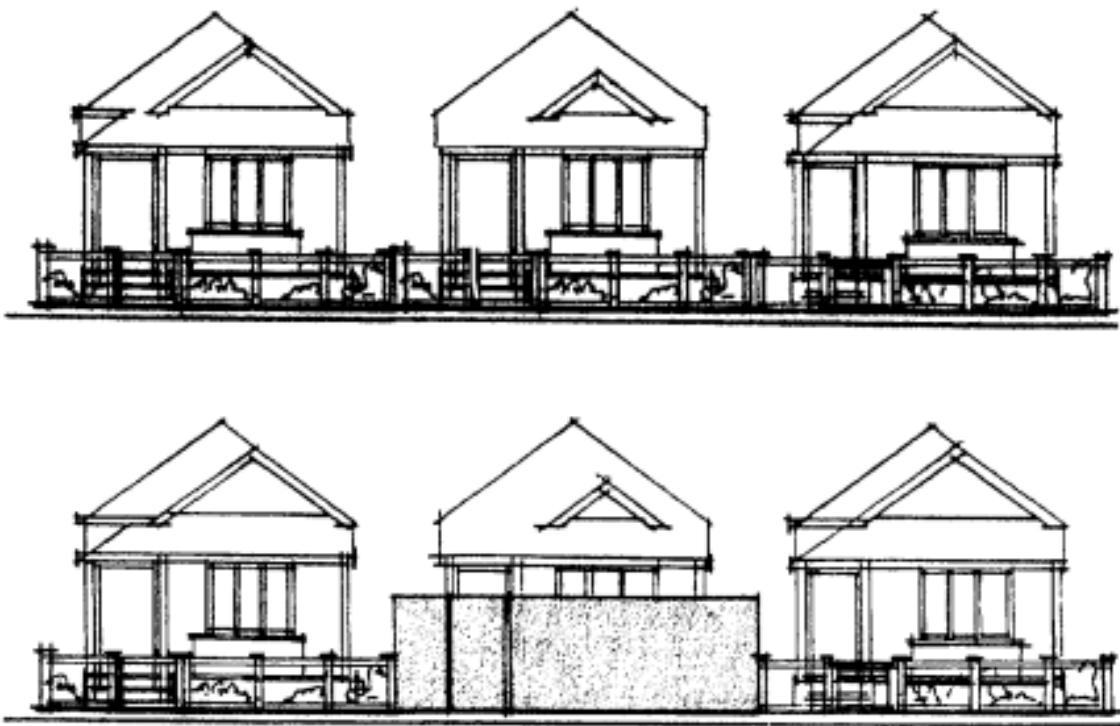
New development incorporates garages into the new dwellings and dominates the streetscape.
